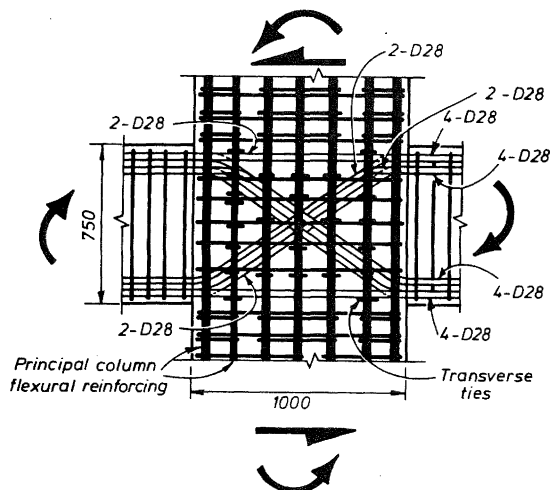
BEAM REINFORCEMENT BENT DIAGONALLY ACROSS A BEAM-COLUMN JOINT CORE
